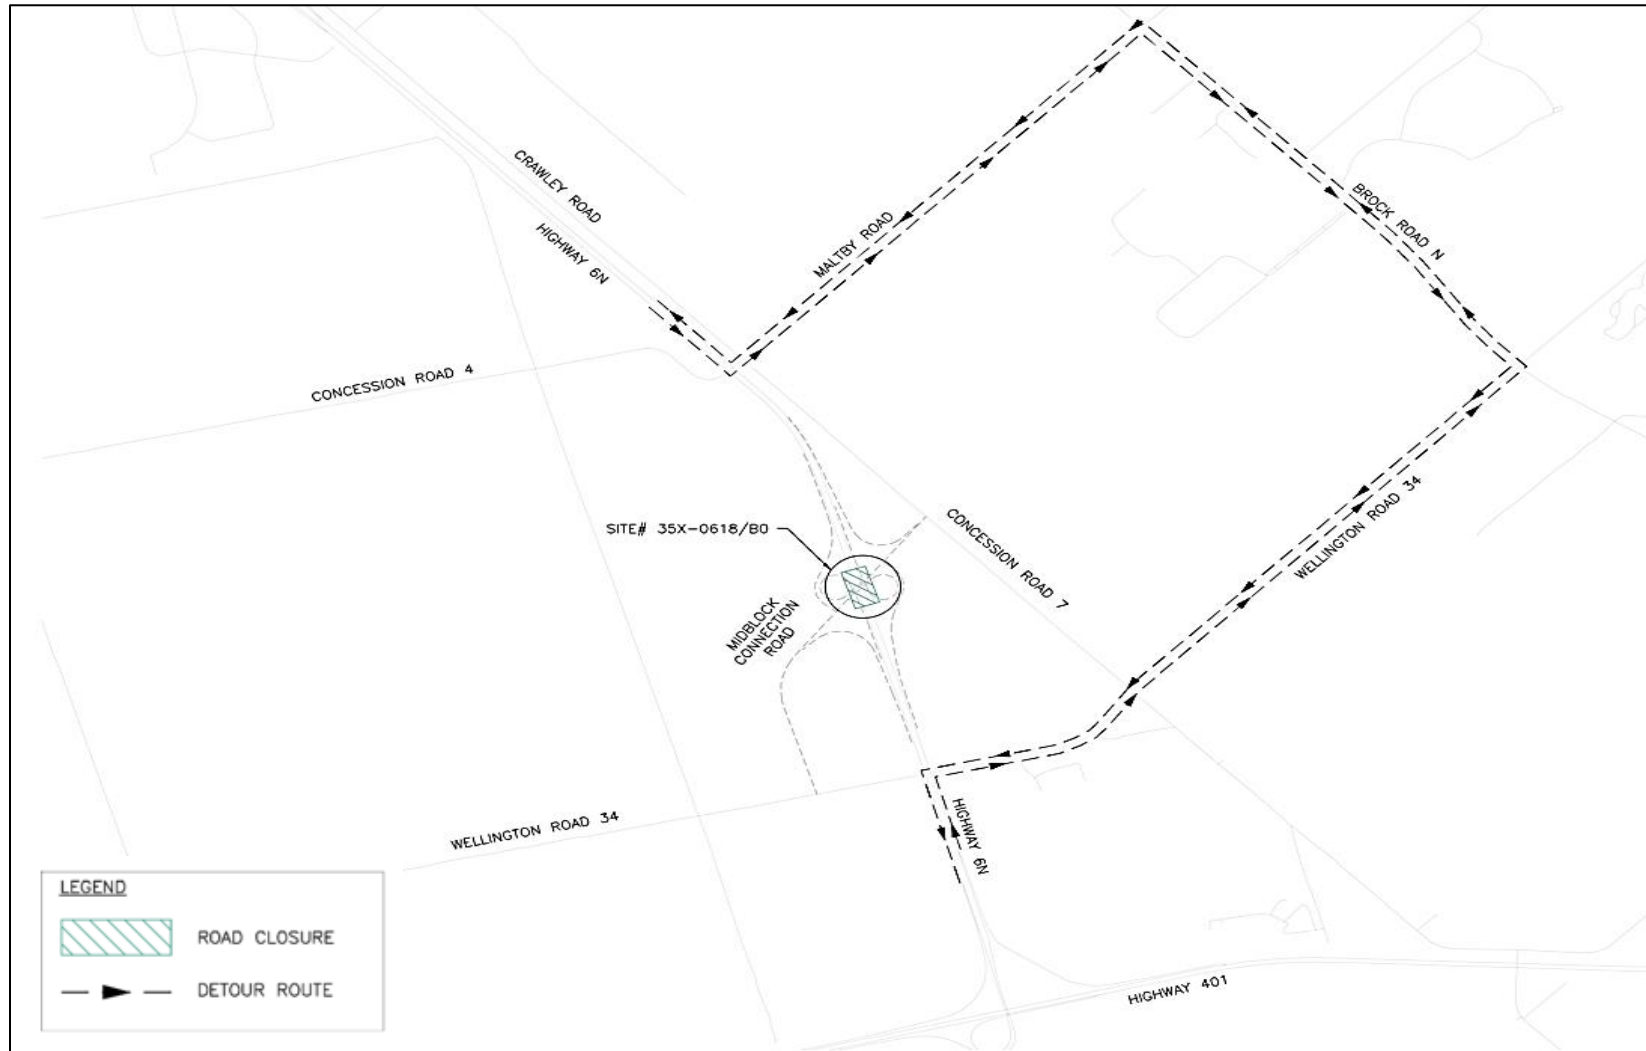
Detour Route for the Installment of Girders on the Midblock Connection Road Bridge (Early Works)
